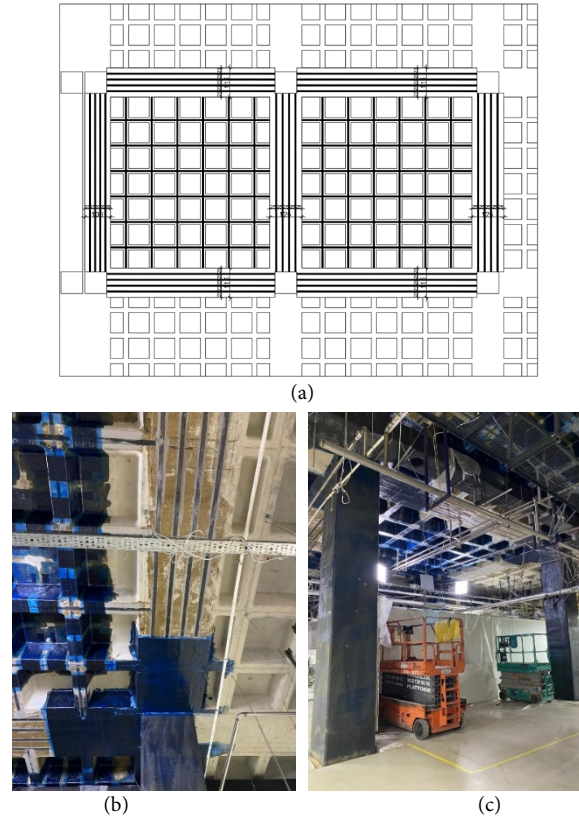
Second Floor CFRP Strips Reinforcement (a) Project Layout (b, c) Application Area
